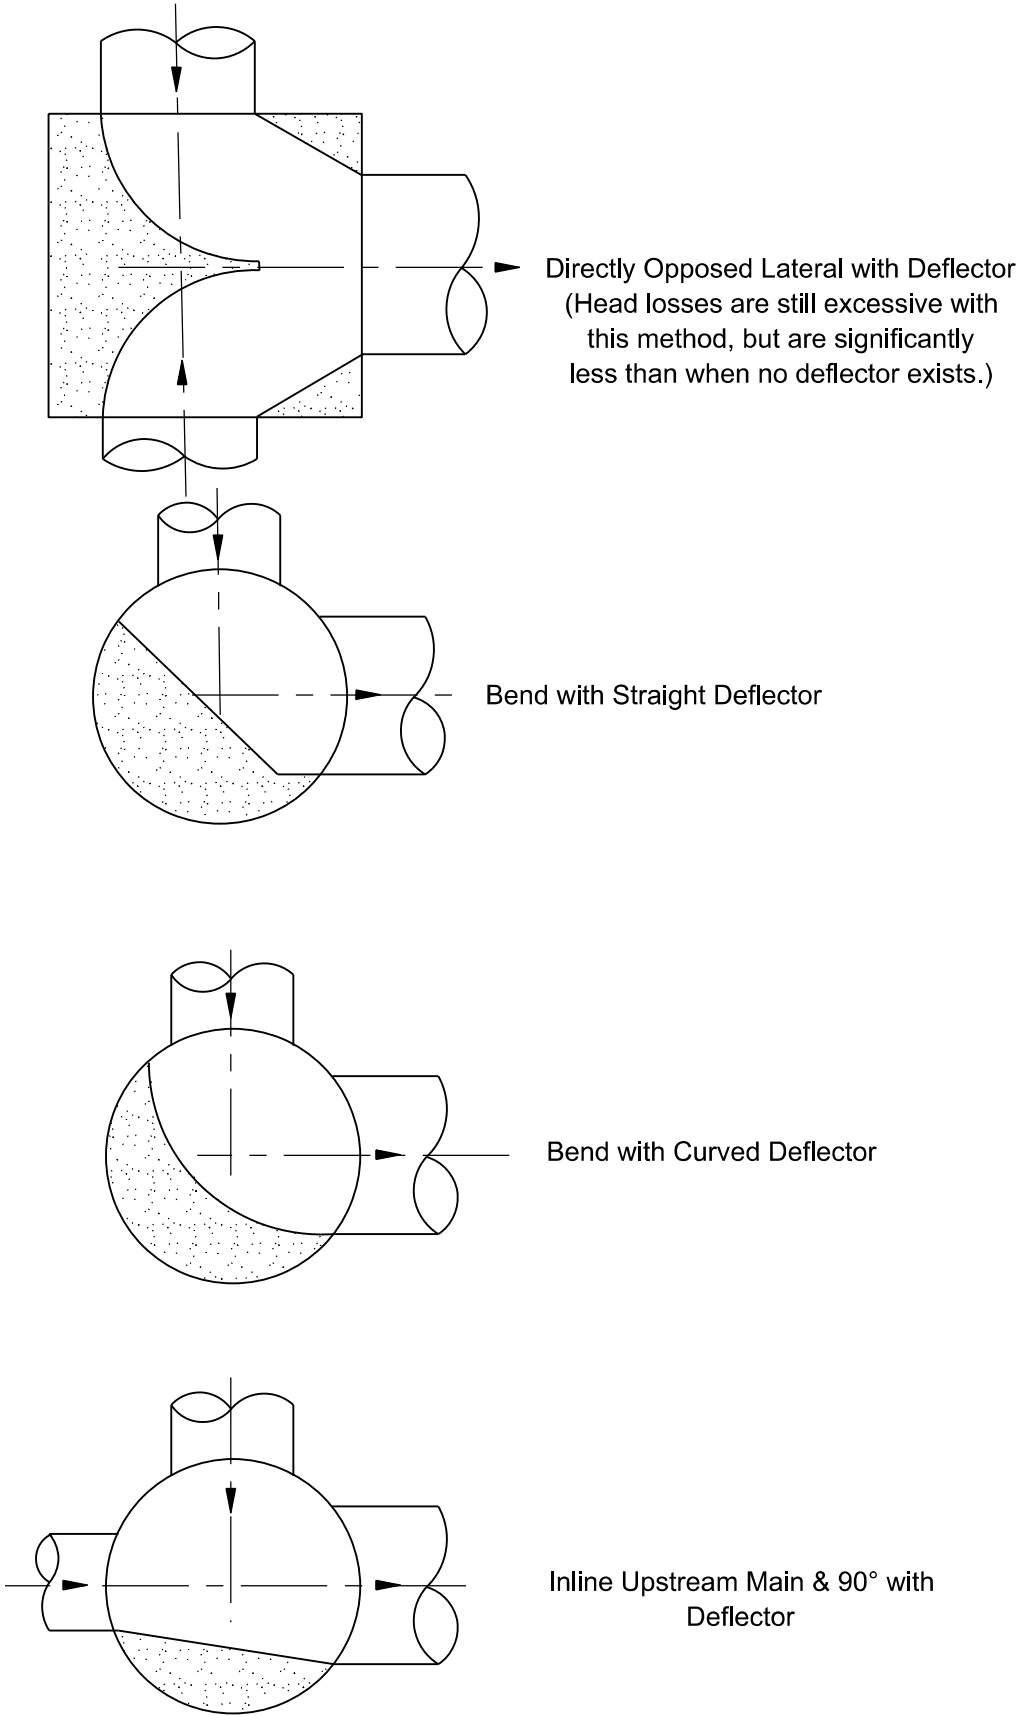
B — EFFICIENT MANHOLE SHAPING
